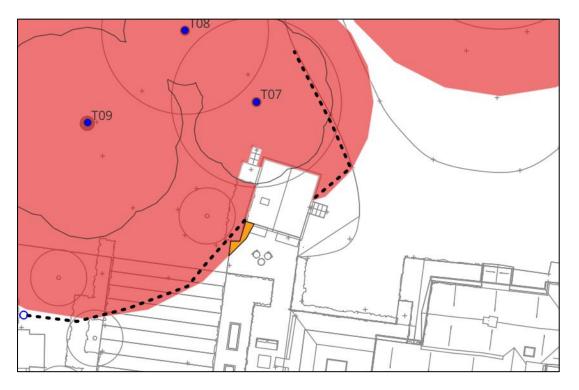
Recommended temporary barrier (dashed line) to prevent construction encroachment within root protection areas of adjacent trees.
